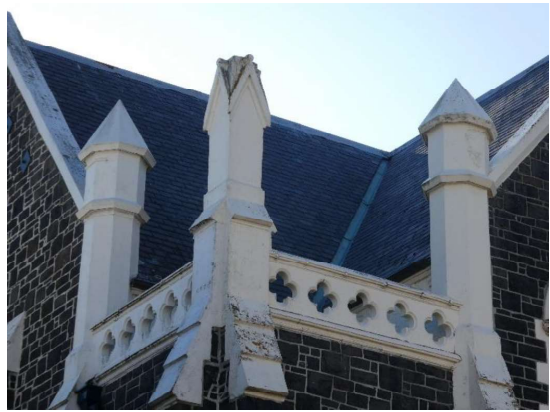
Showing the corroded ridge flashings to the north.
